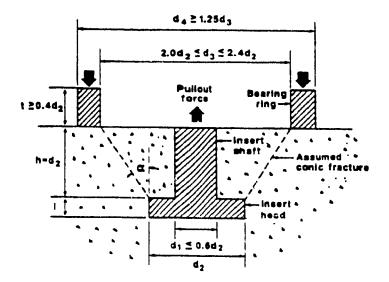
SCHEMATIC CROSS-SECTION OF PULLOUT TEST'
